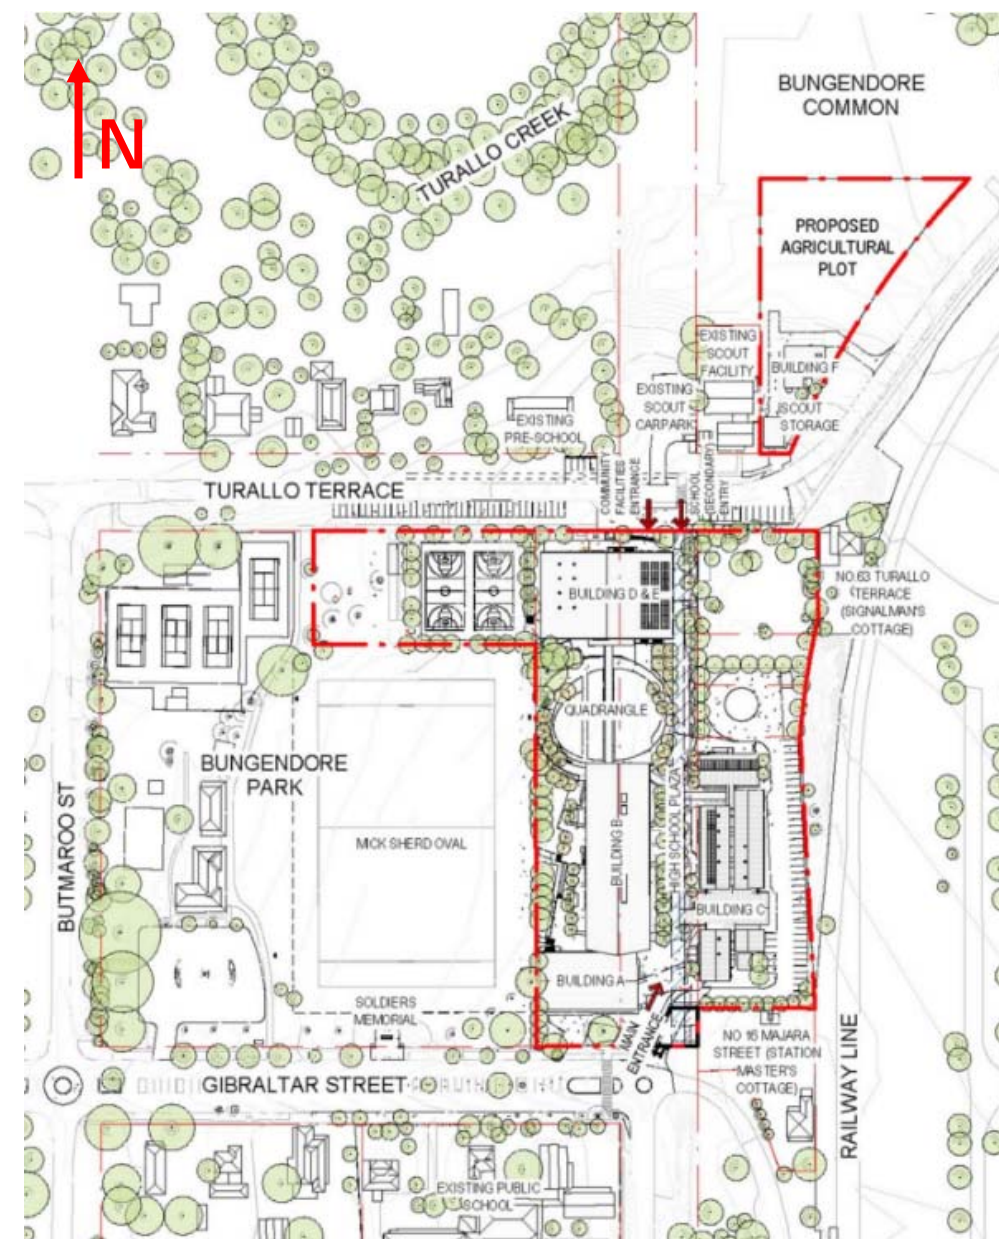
Proposed Architectural Overall Site Plan (Source: TKD Architects)
